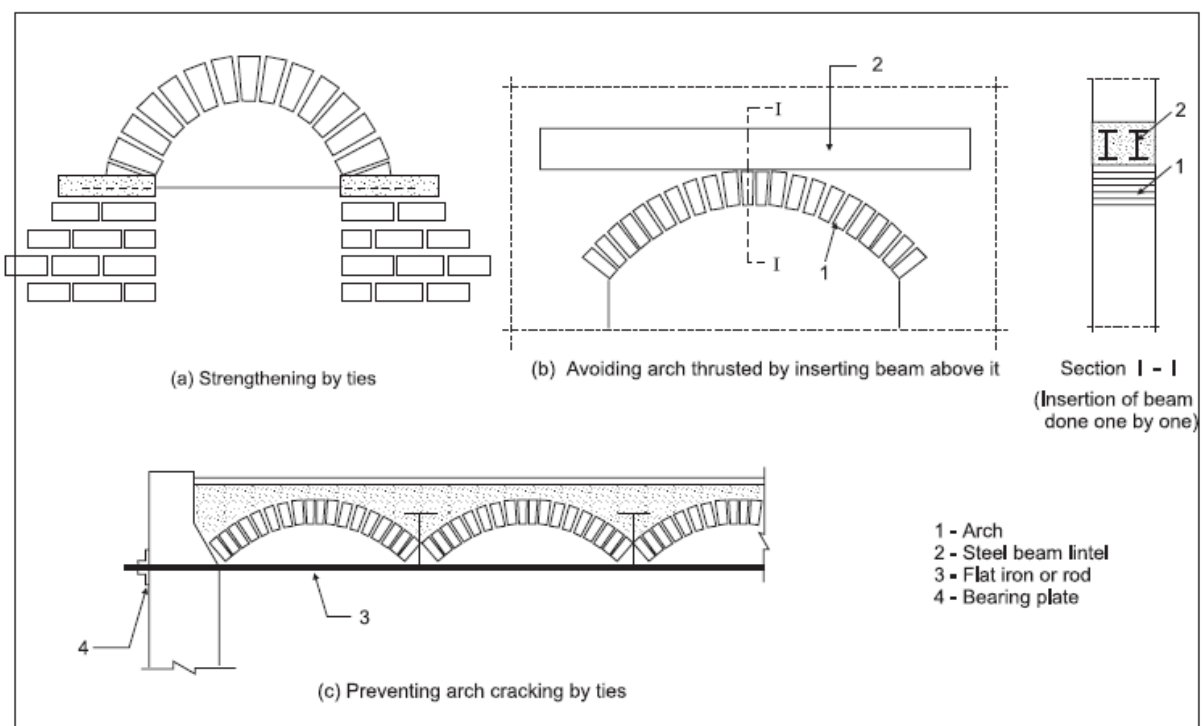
Strengthening an arched opening in masonry wall
